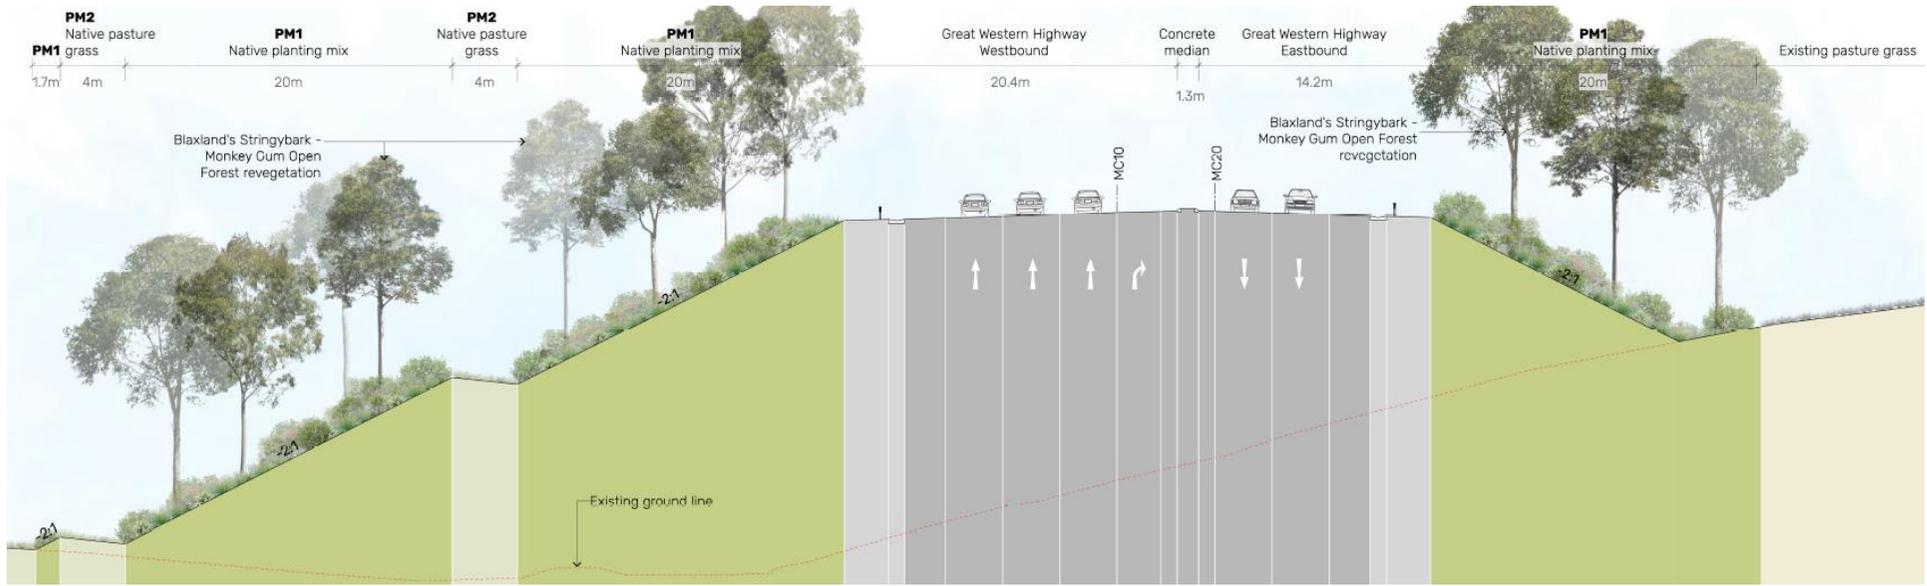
c Typical cross section of Great Western Highway requiring deep fill
